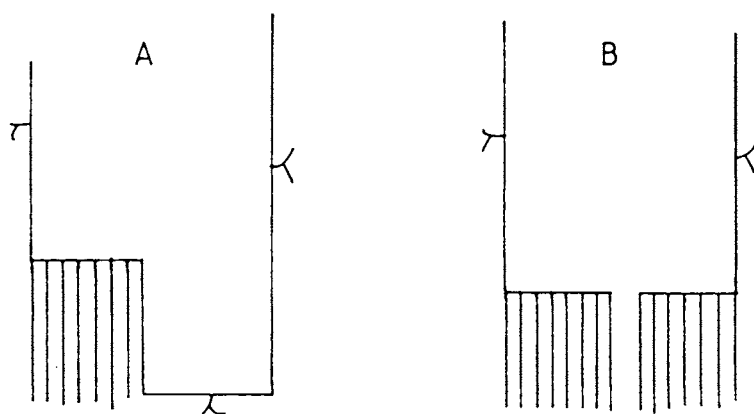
Shaft sinking by drilling and blasting. A) Bench blasting. B) Pilot hole blasting [4]
